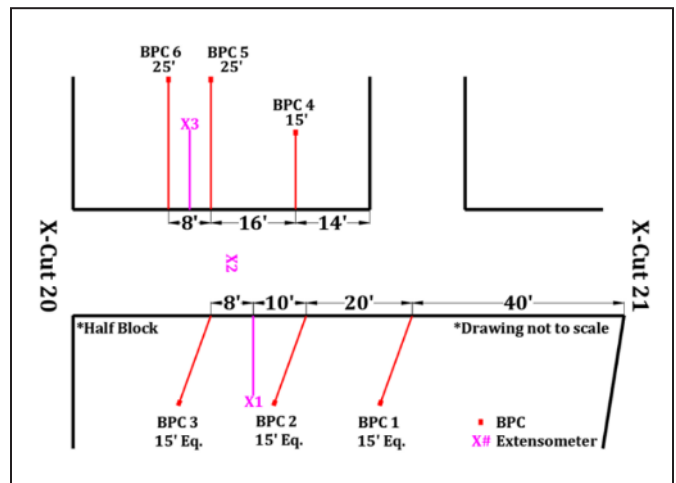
Instrumentation layout for Site 2 installed from the #1 entry (after McElhinney et al., 2023).
